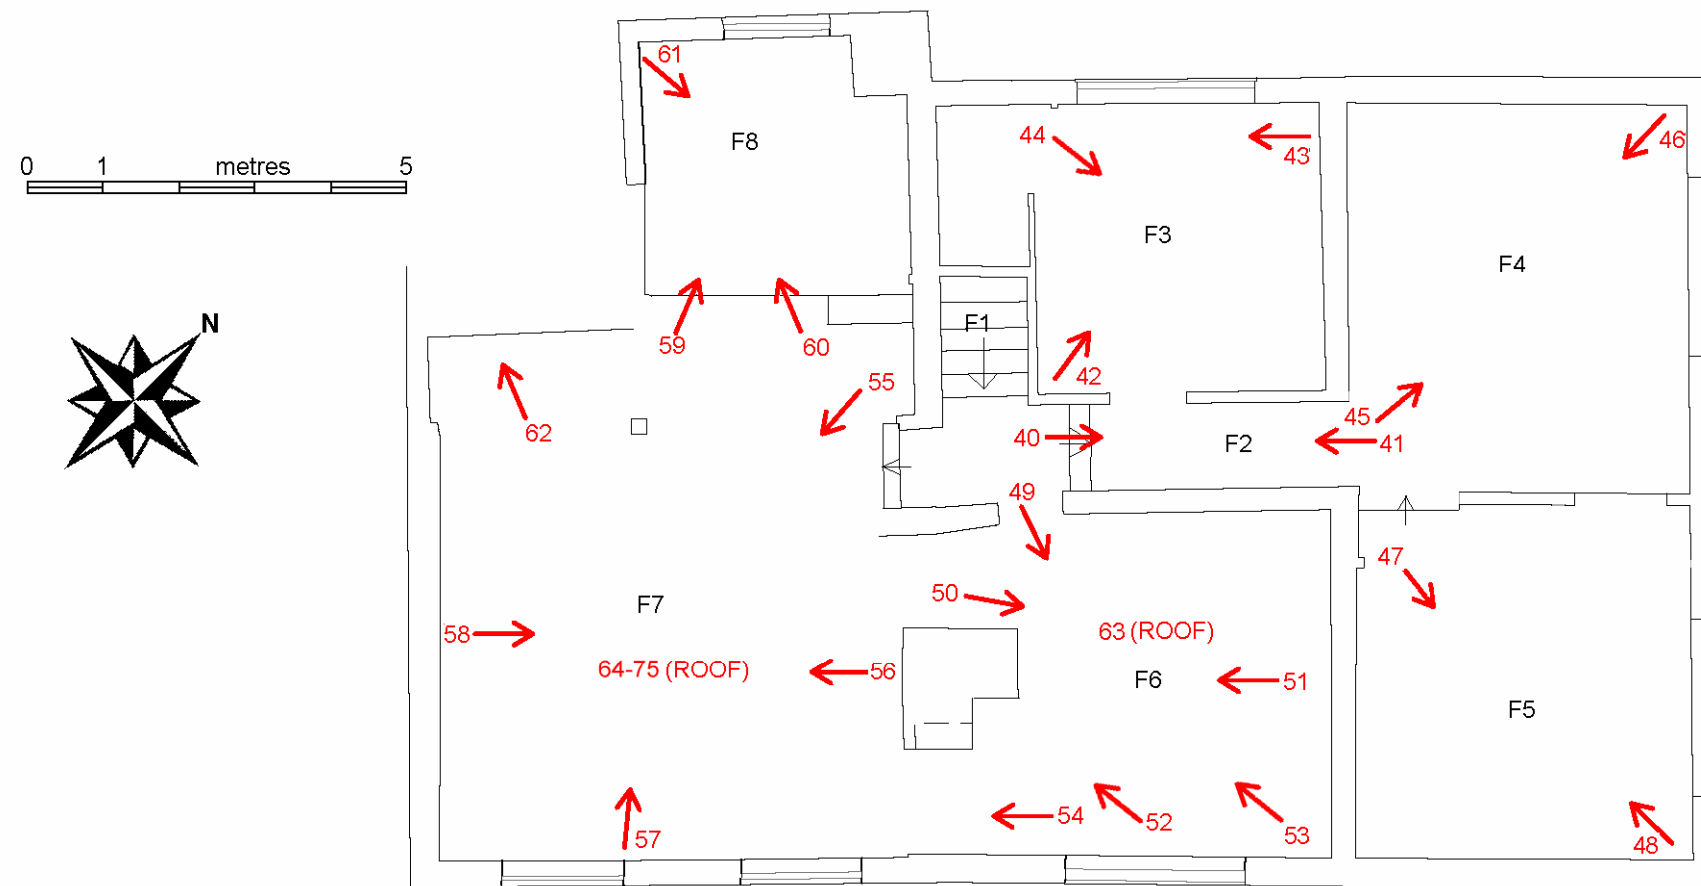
First floor plan at survey, with photo locations (*scale 1:100*)
